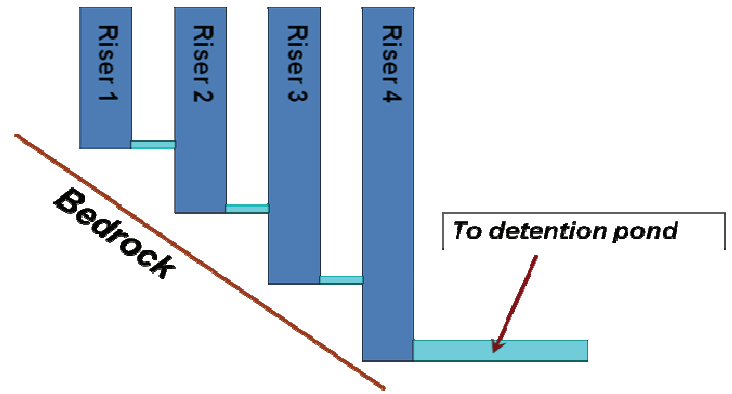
Schematics of risers collecting surface water and connecting horizontal PVC drainage pipes
